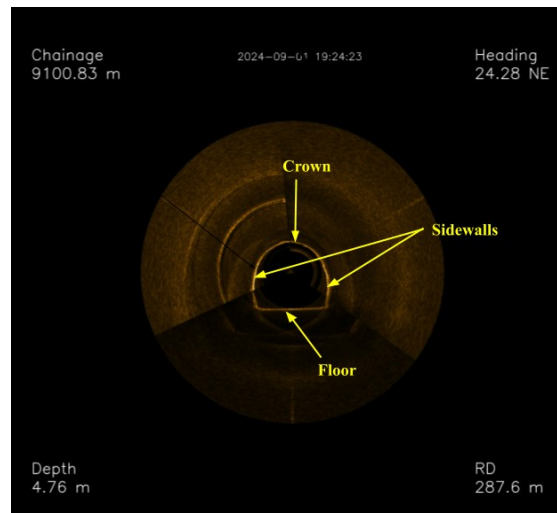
Acoustic SONAR image of Tunnel with marking of Crown, Floor and Sidewalls
